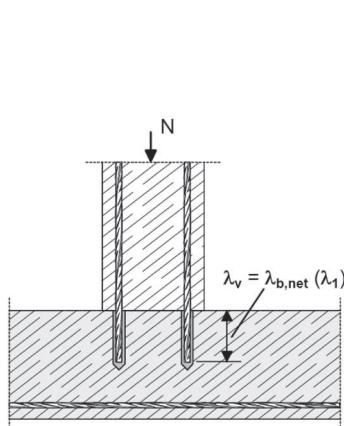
Rebar connections for items primarily subjected to compression. The rebars are subjected to compression.
